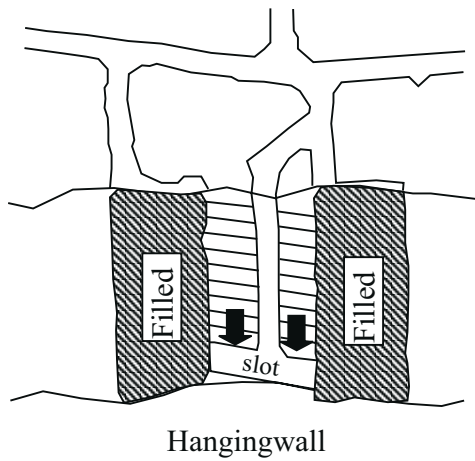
Dynamic loading of a fully exposed hangingwall plane.
